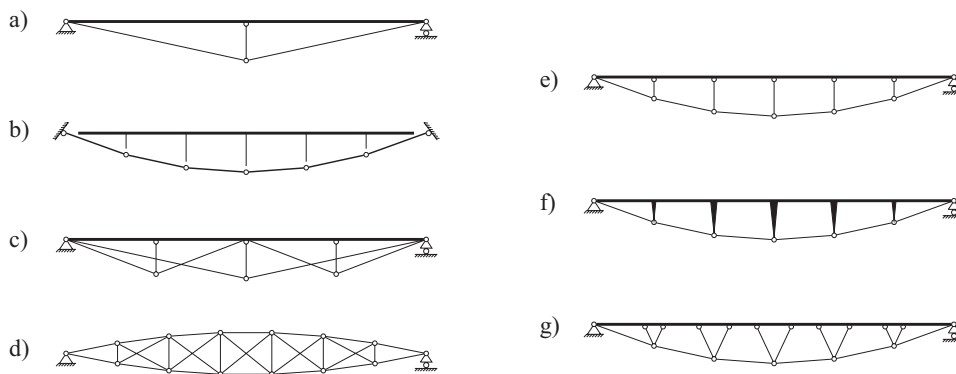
Underspanned simply supported systems for bridges: (a) simple underspanned beam; (b) tension member anchored in the soil; (c) Fink's beam; (d) fish-bellied girder; (e) underspanned beam with hinged deviation members; (f) underspanned beam with deviation members clamped at the deck; and (g) underspanned beam with V-shaped deviation members (adapted from [2])
